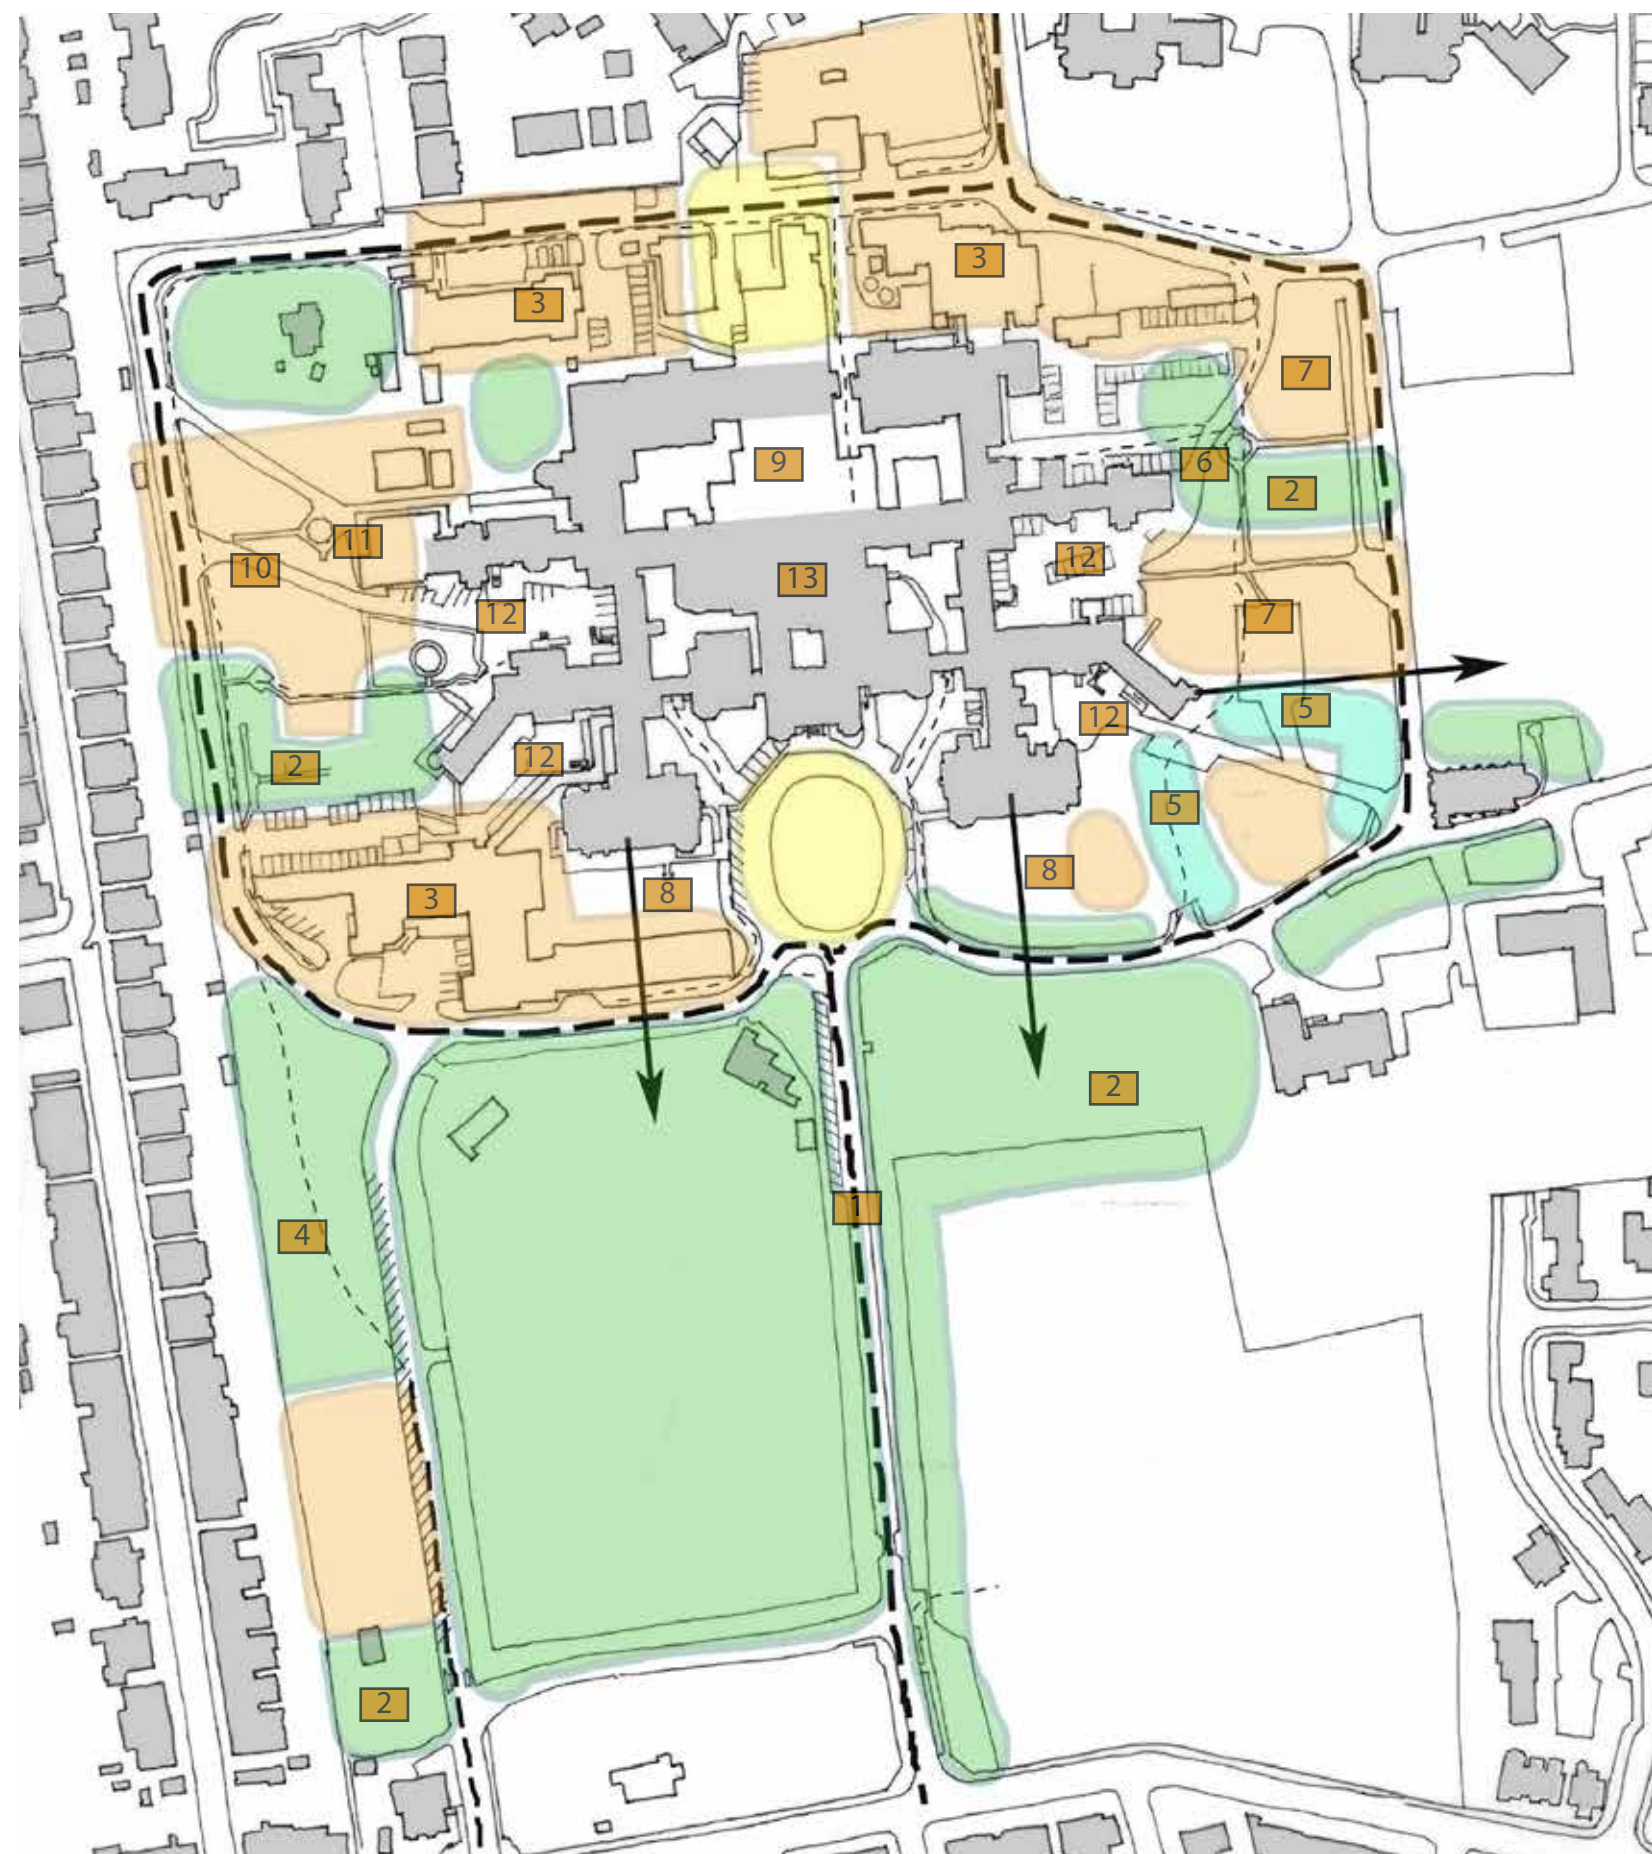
Existing site plan showing a summary of opportunities for the Application Site
